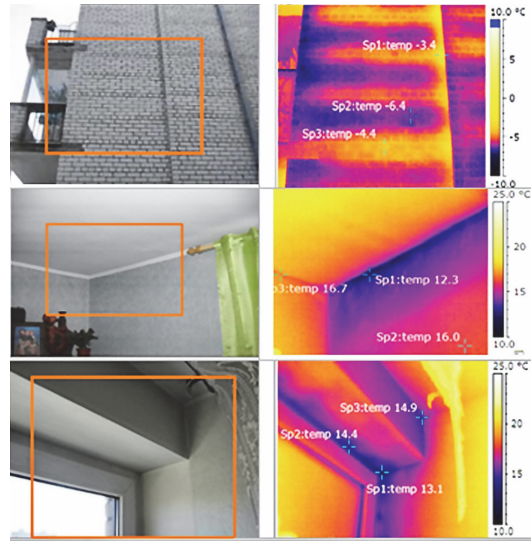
Thermal bridges of a brick building from outside (top) and from inside (middle and bottom)
